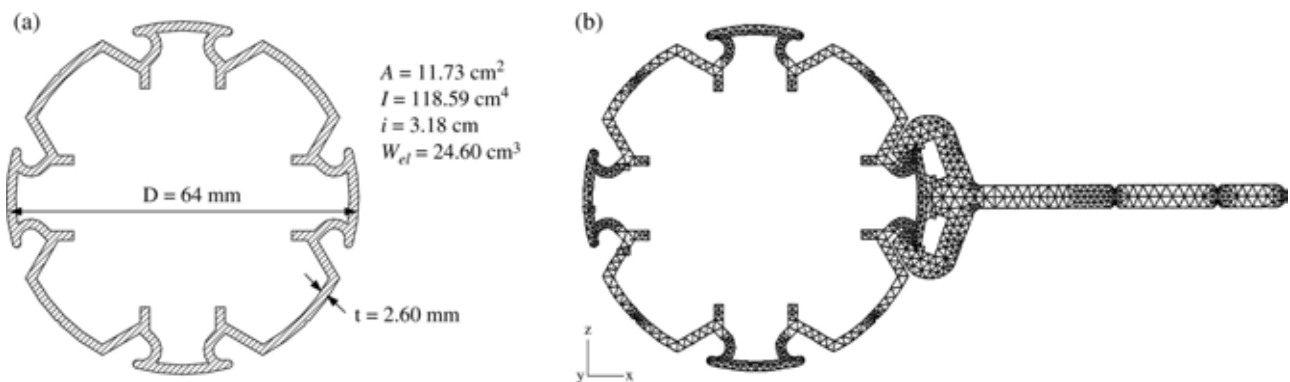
(a) Column section. (b) Plane strain model of connection.
